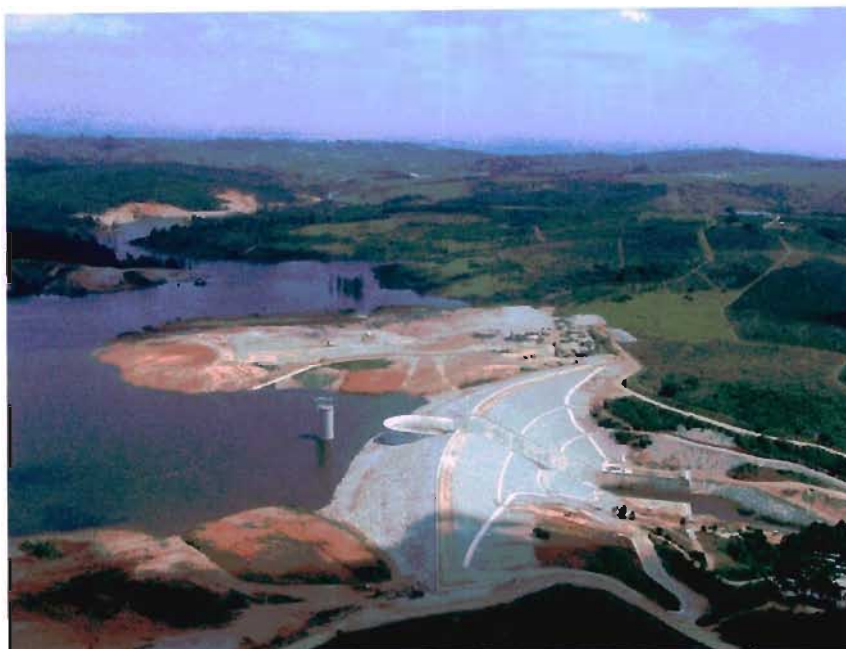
Oblique aerial view looking north of completed dam site showing central concrete trough spillway, inlet tower, outlet conduit and rip-rap protected embankment (photo courtesy of Department of Water Affairs and Forestry, 2002).
